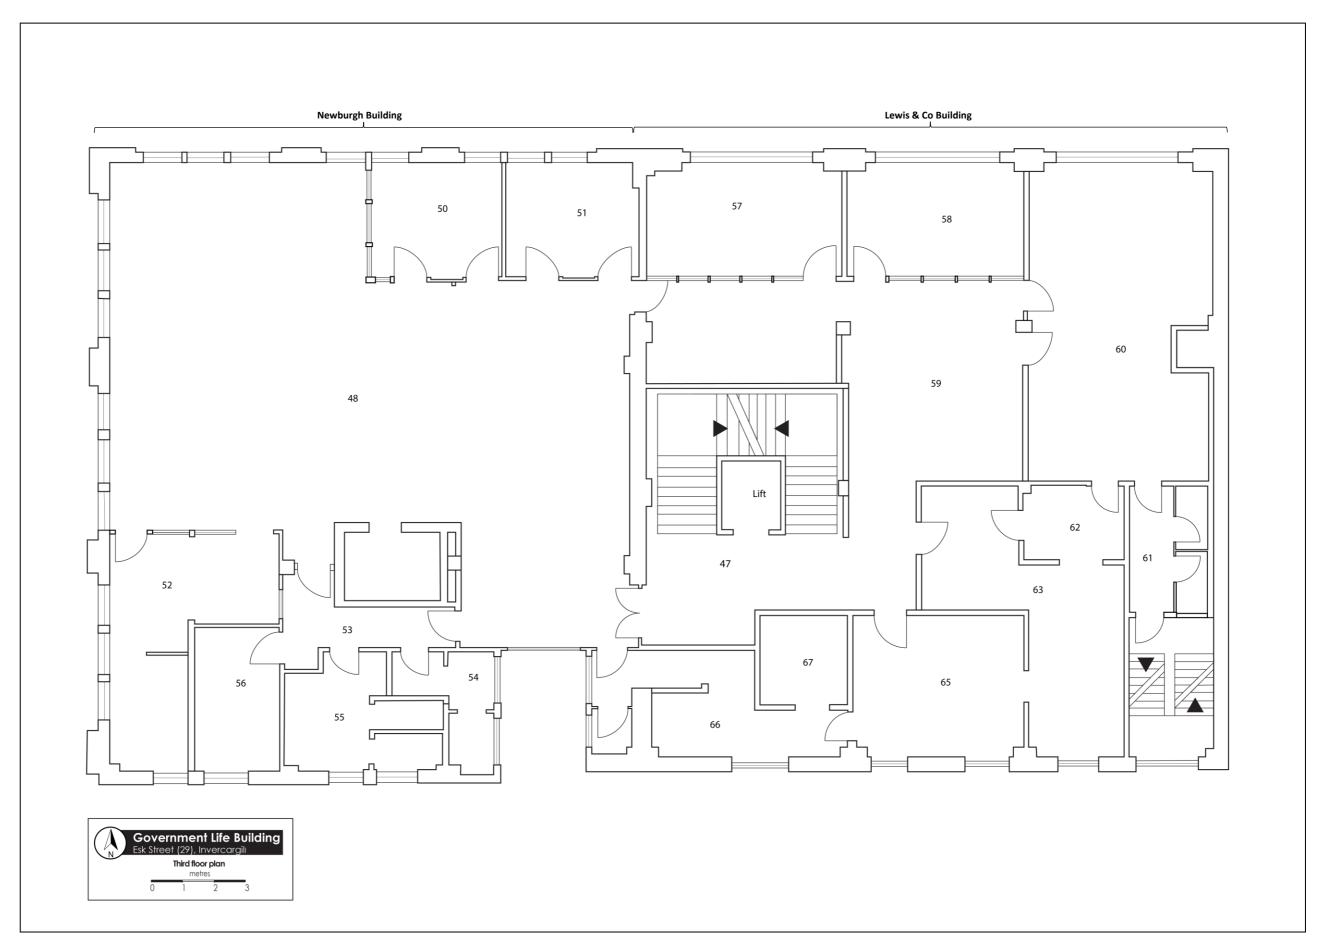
Third floor plan of the Lewis & Co. (right) and the Newburgh (left) Buildings, collectively known as the Government Life Building.
